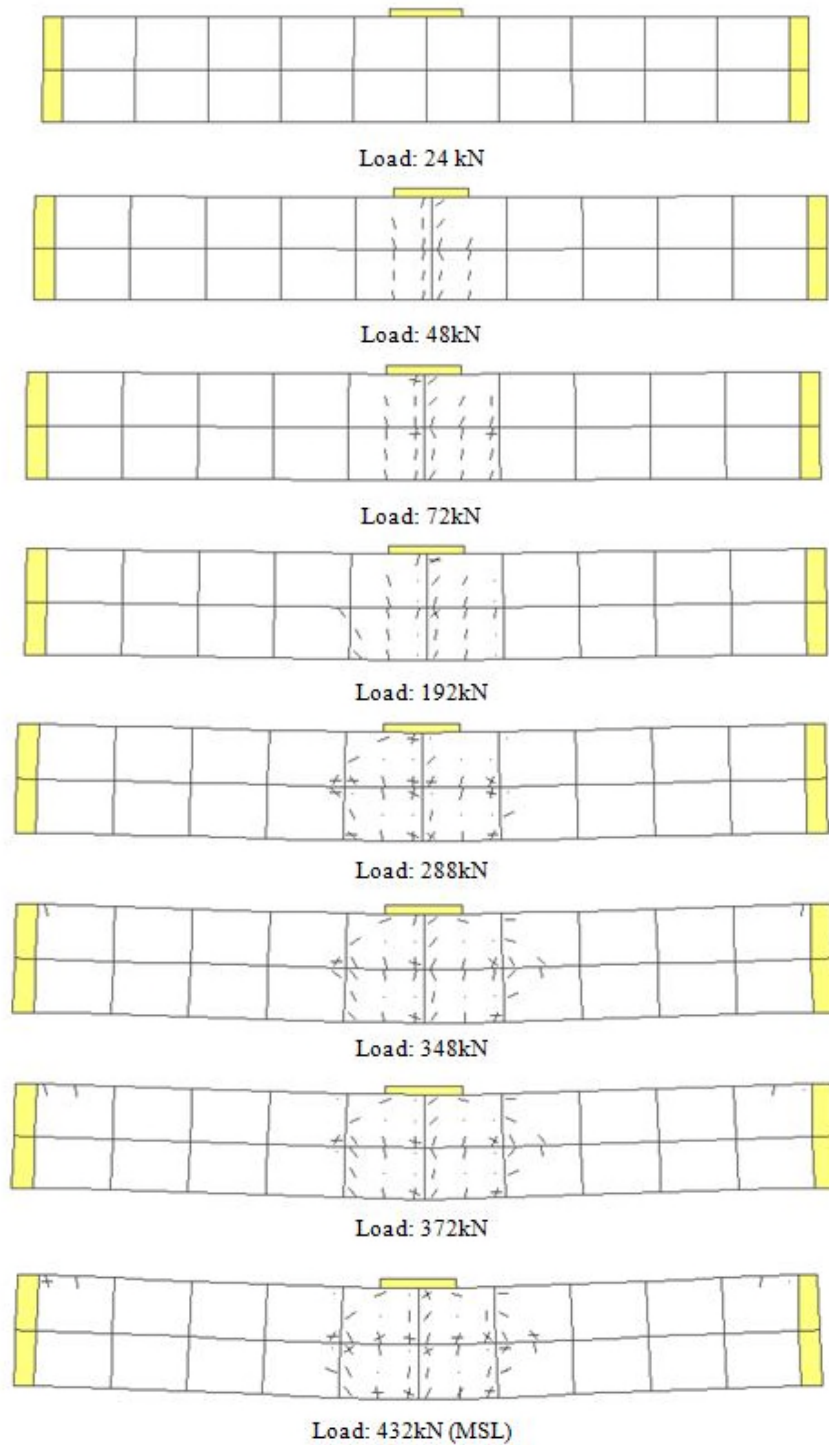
Crack patterns of beam NB at various load levels (short lines and dots indicate cracking intersecting the beam side face at an angle larger and smaller, respectively, than 45°)
